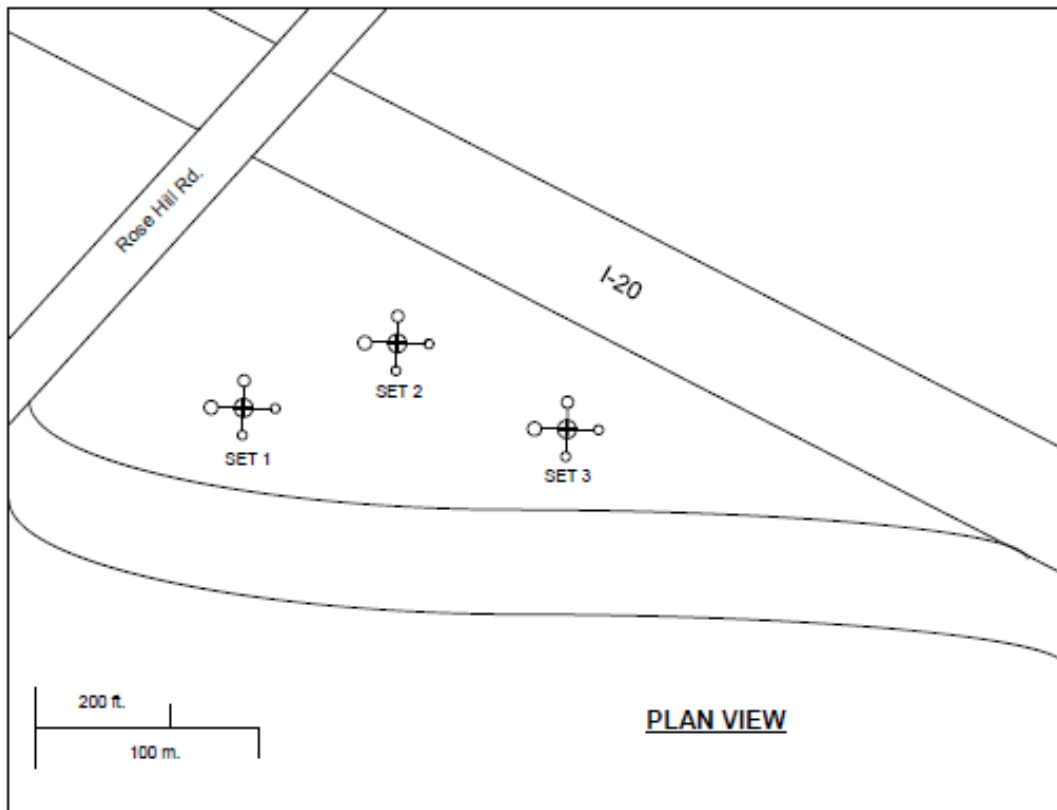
Plan View of Test Setups with Three Reaction Piers and Twelve Test Piers
